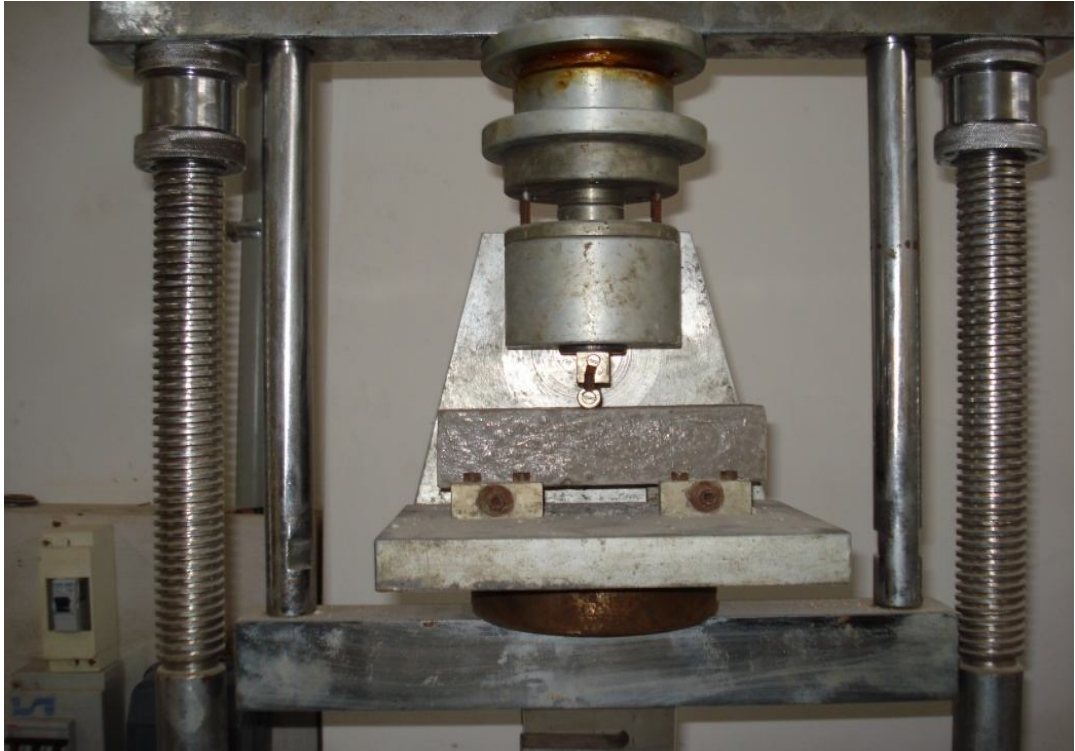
Test Specimen was Placed on Flexural Testing Machine.
